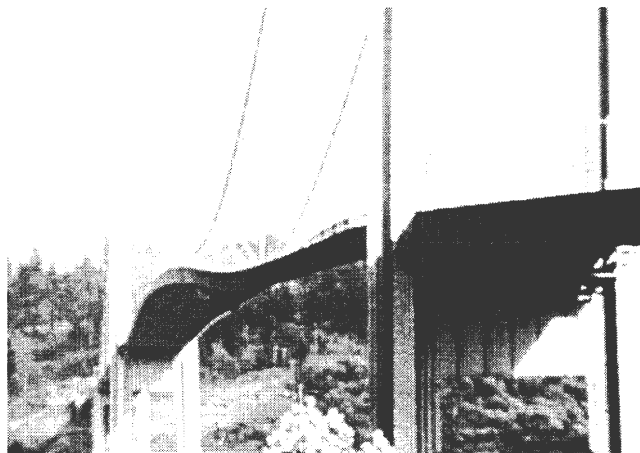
Collapse of Tacoma Narrows Bridge Deck (Photo courtesy of University of Washington Libraries)
